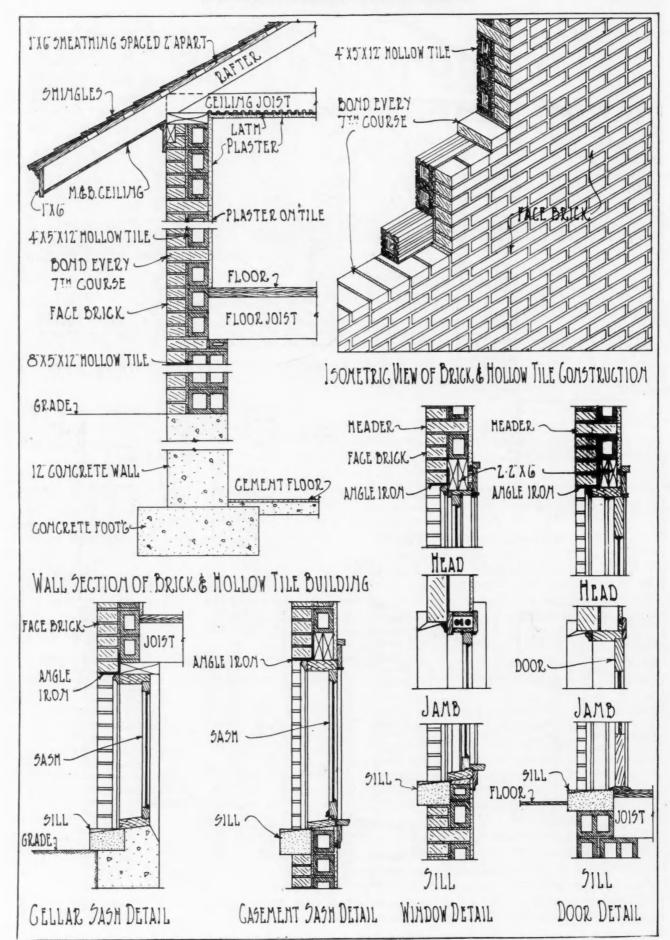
Plate II. Combination Face Brick and Hollow Tile Construction in Which Design Assumes a Division of Load Between Brick and Tile.
